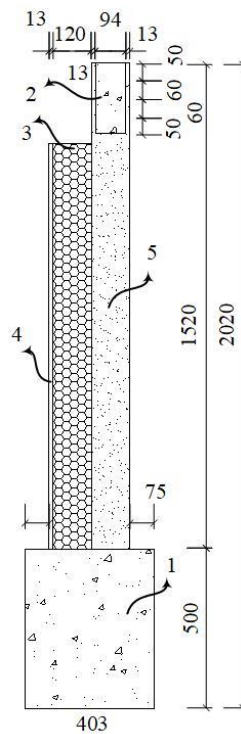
Elevation view. Notes: 1. fixed beam; 2. loading beam; 3. polystyrene insulation board; 4. gypsum protection board; 5. gypsum-concrete dense-column composite board.
